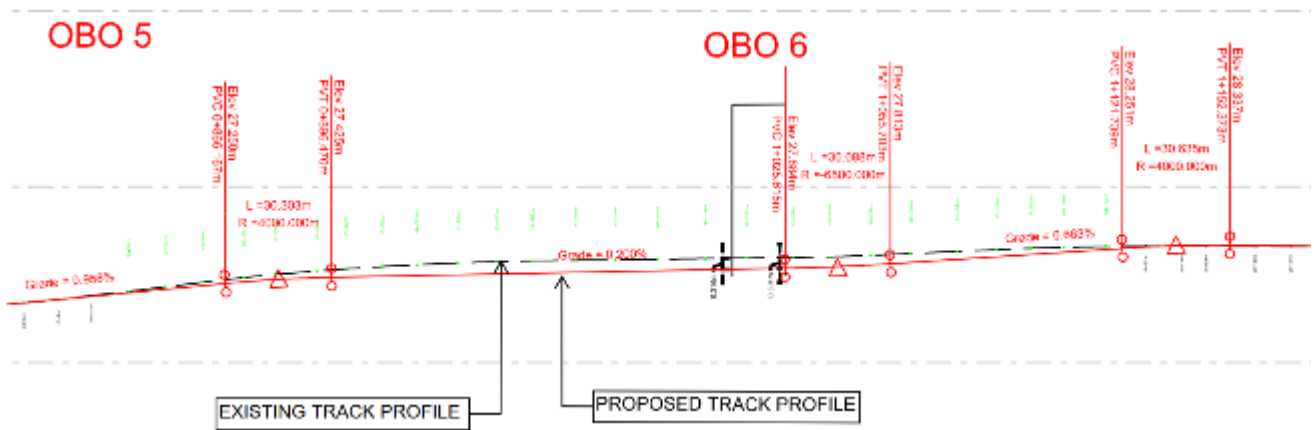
Longitudinal Profile of the Proposed Alignment in the Area of Old Cabra Road Bridge (OBO5) and Cabra Road Bridge (OBO6)
